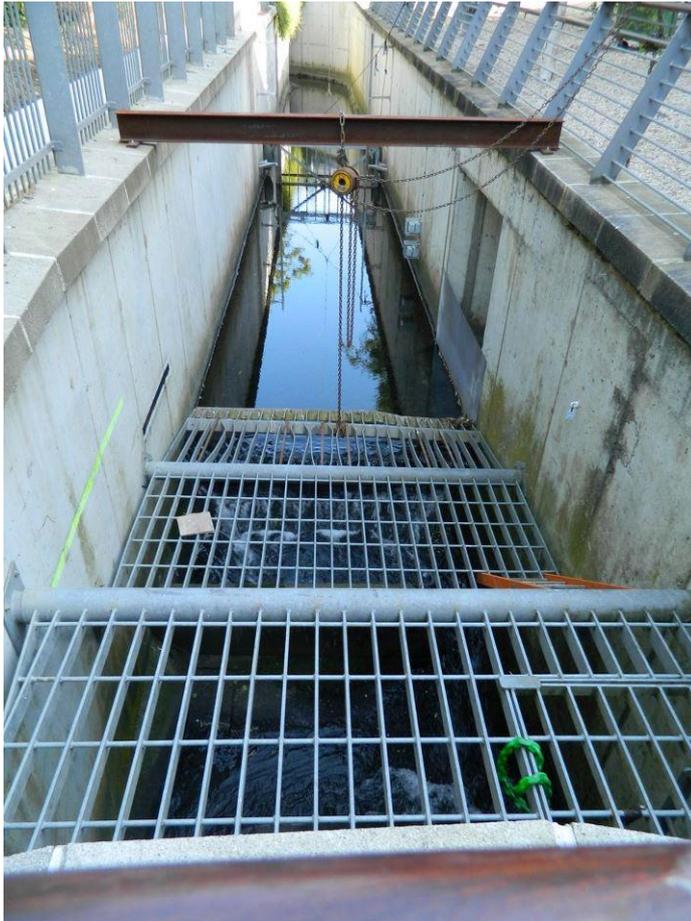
Dundrum Slang River. Newly culverted section of the river located at the back of Dundrum Shopping Centre. 2012 (Source: author)
